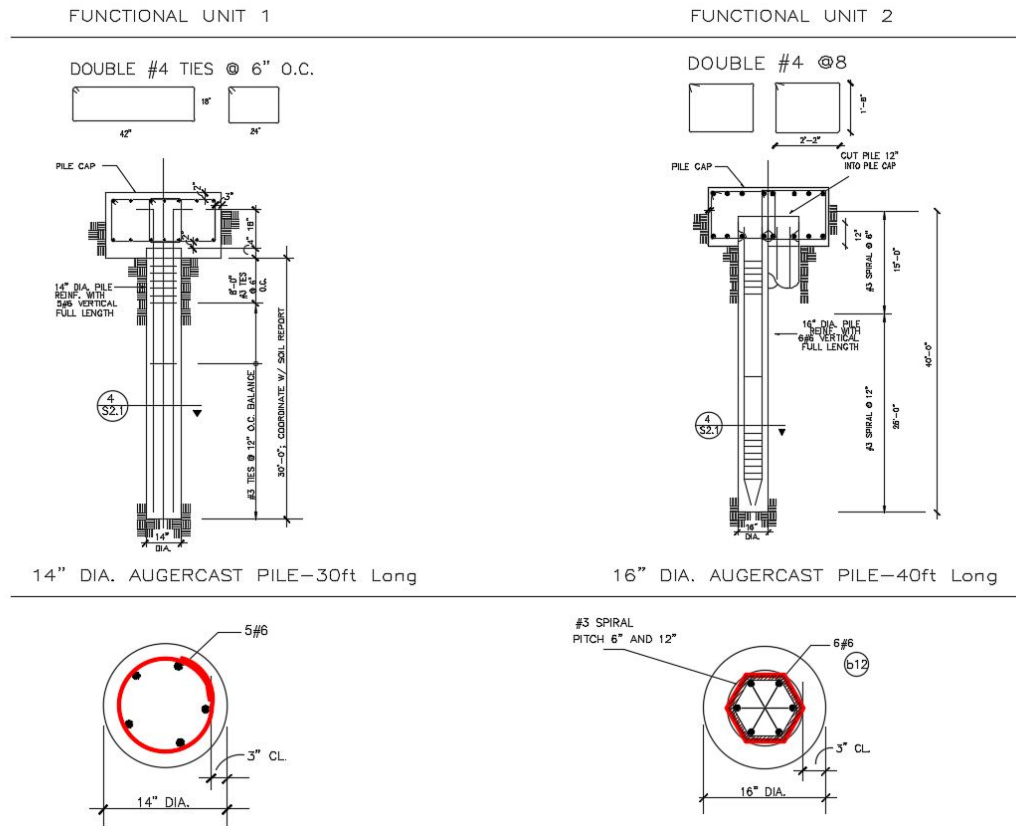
Auger Cast Pile Section of FU-1 on the right and FU-2 on the Right
